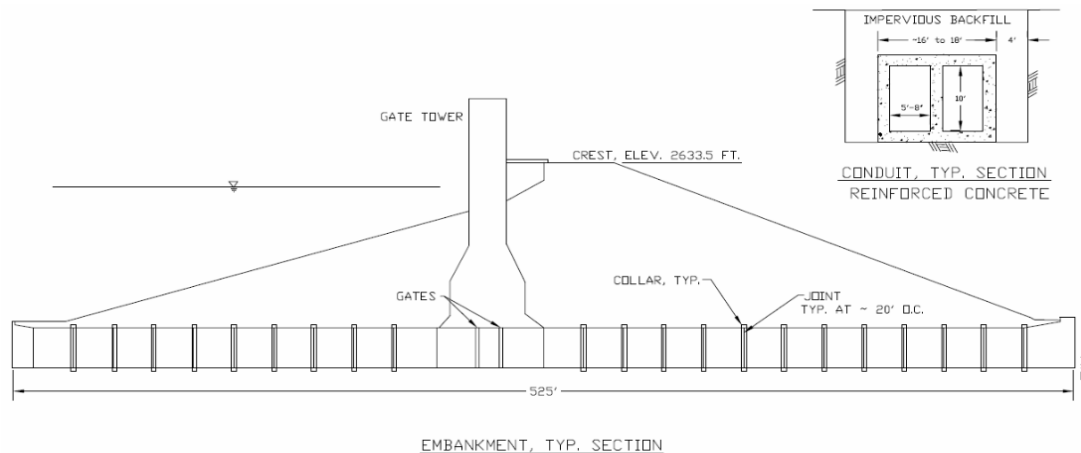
Profile and Cross-section View of the Borel Canal Conduit
